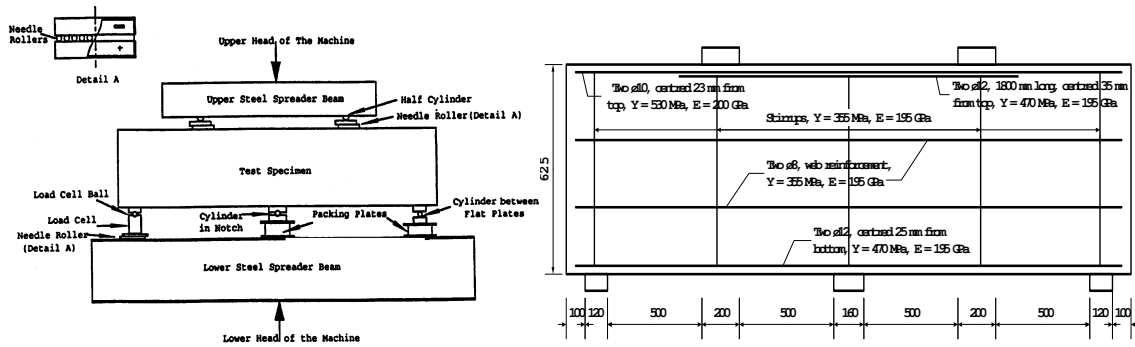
Test setup and specimen dimensions (Not to scale. All dimensions in mm.)
